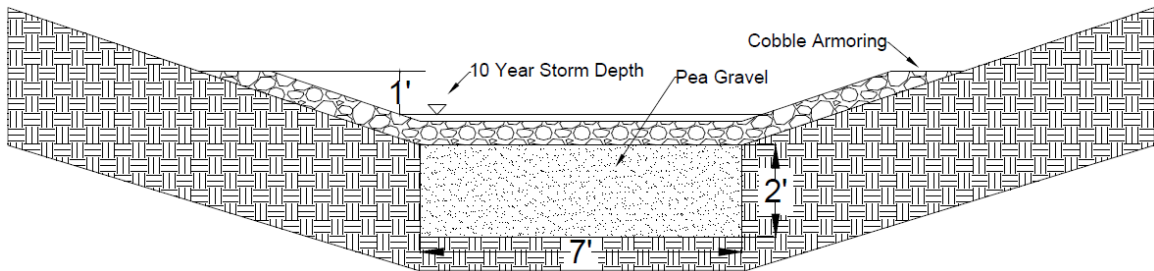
Width cross-section for example horizontal filter trench in WS 2
